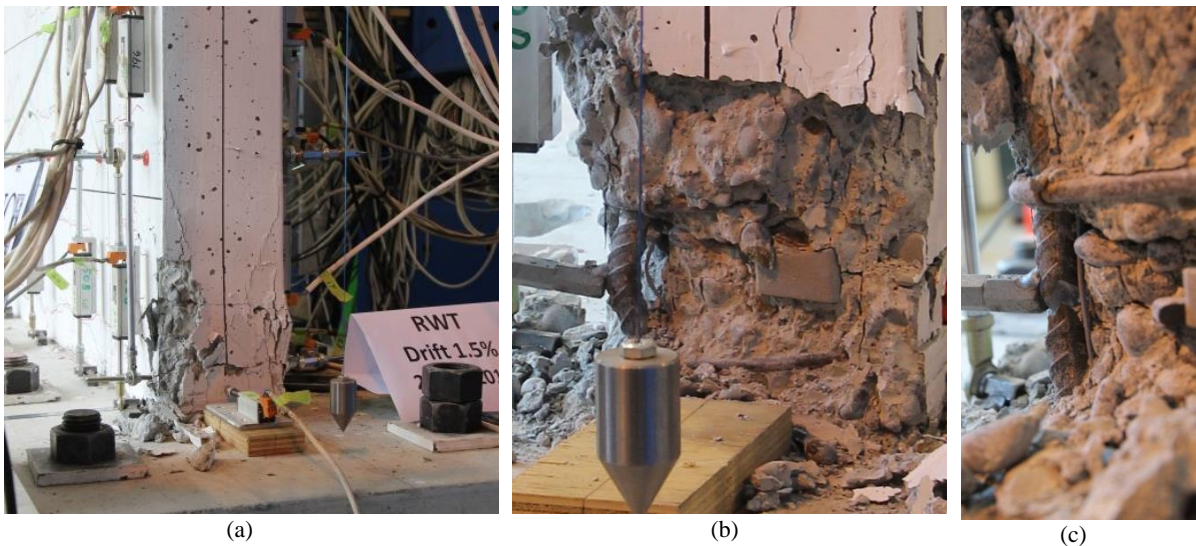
(a) Cover spalling; (b) bar buckling; (c) bar fracture - Specimen RWT
